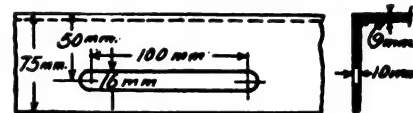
DETAIL OF TYPICAL FORM PLATE
